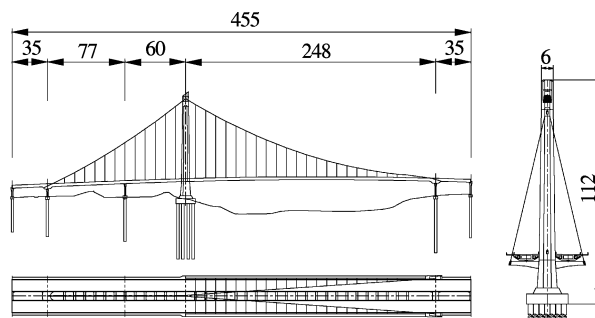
General layout of the Jiangxinzhou self-anchored suspension bridge (unit: m)
